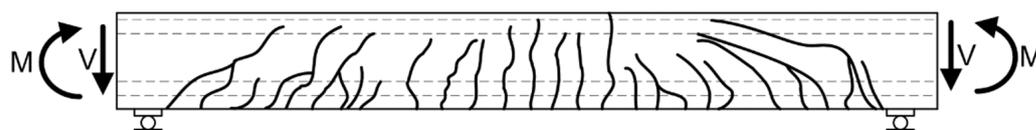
Macrocracks due to shear; M —as in Figure 5, V —shear force.
